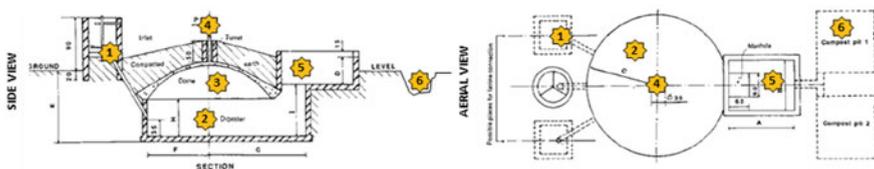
Side view and aerial view of typical fixed dome underground digester (GGC2047); 1: Inlet chamber with inlet pipe, 2: Digester, 3: Dome (gas storage), 4: Gas outlet, 5: Compensation chamber with overflow point, 6: Storage/compost pit
